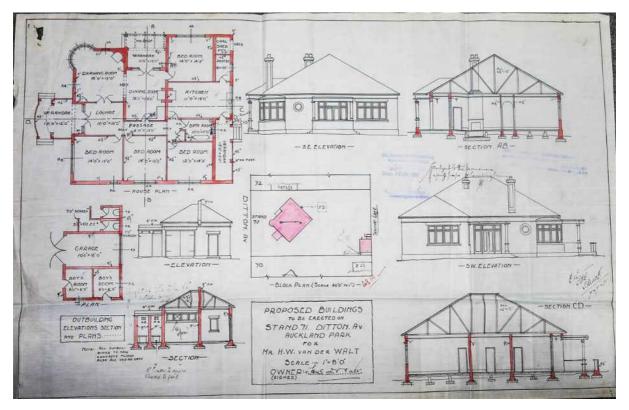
Original plan for proposed building on Stand 71 for Mr H.W. van der Walt from (Source: City Council of Johannesburg, Plans Archive)
